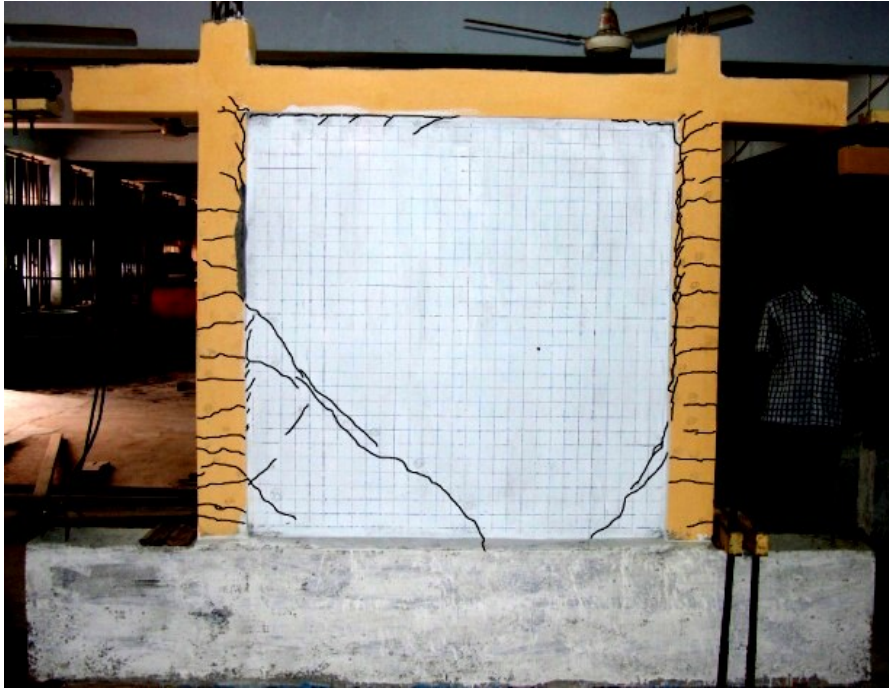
(a) Crack patterns at maximum lateral load in brick infilled RC frame model specimen A1
